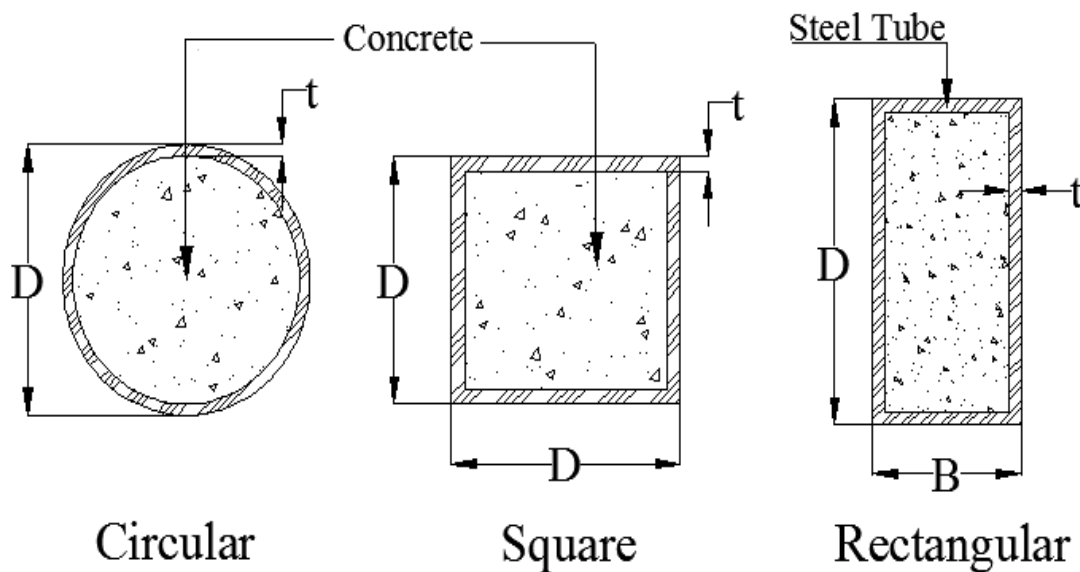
Concrete filled steel tubular (CFST) core configuration
